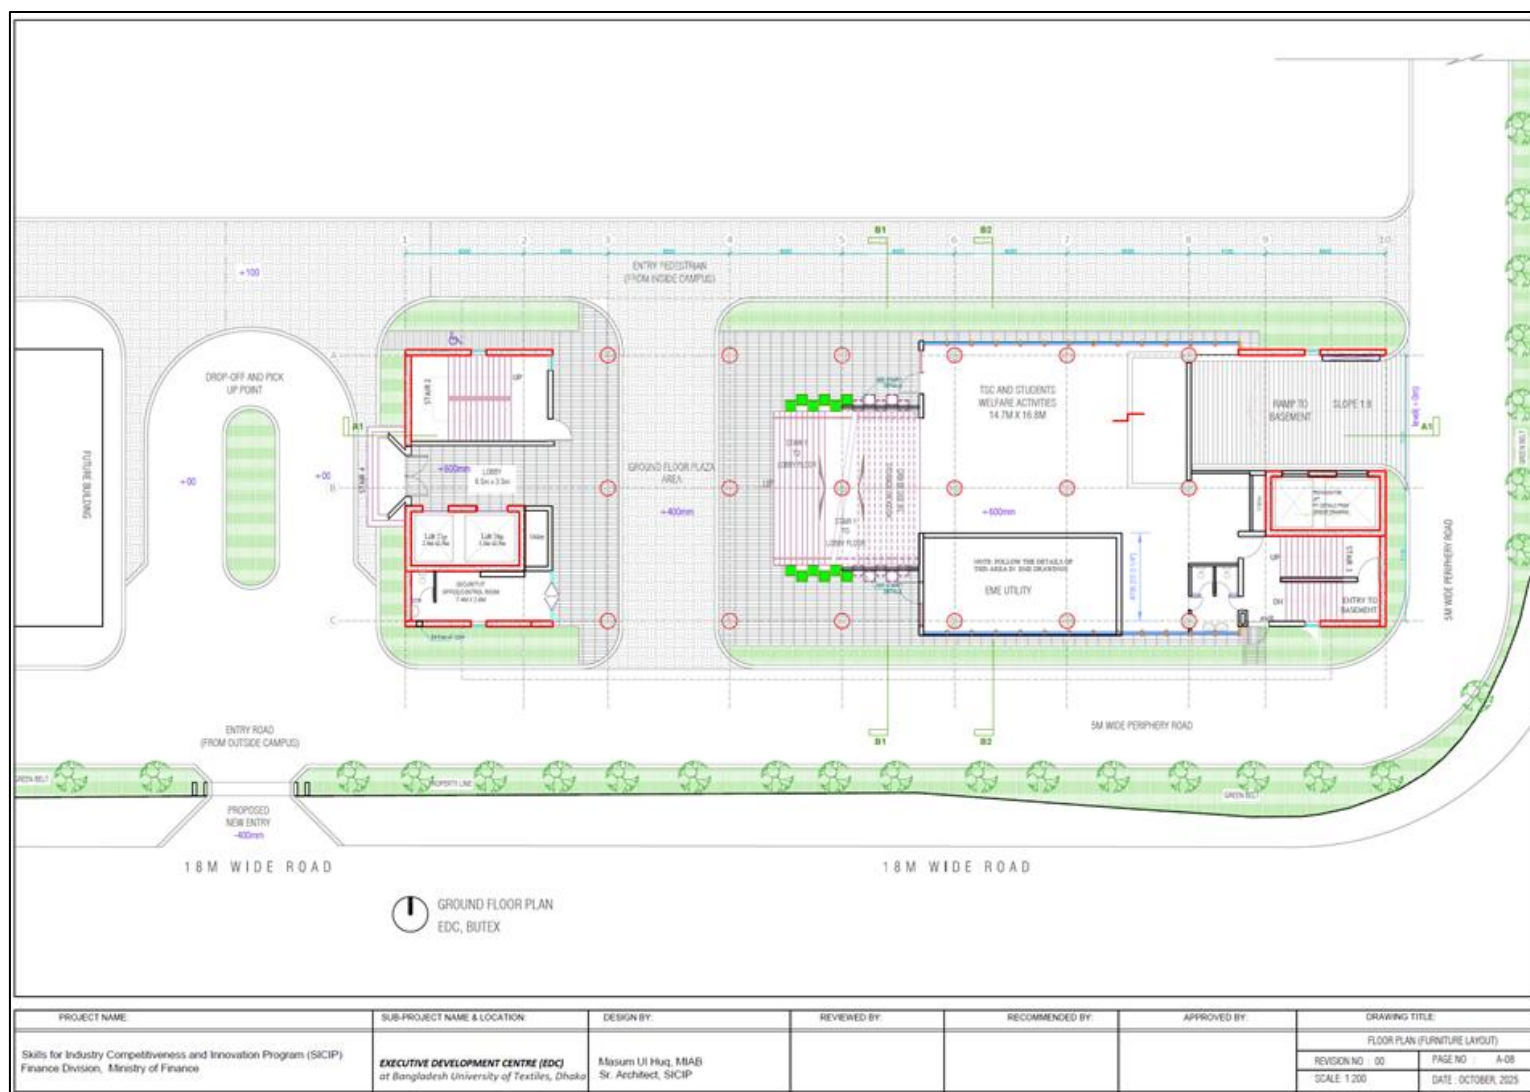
Ground floor Layout of the proposed EDC BUTEX building complex
